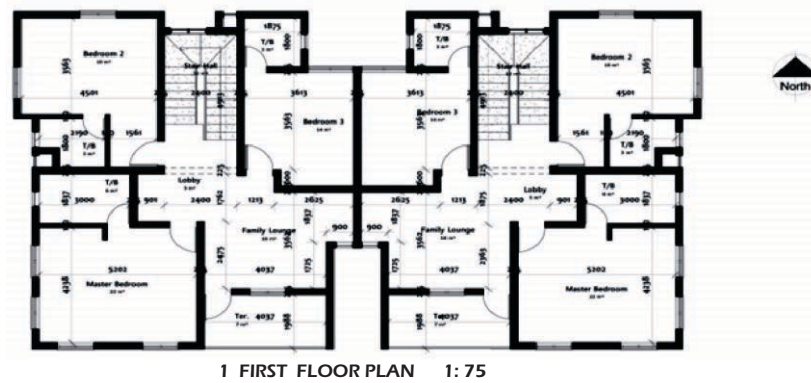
(Type 3): Typical first floor plan of two families' semidetached storey housing unit in the study area.
